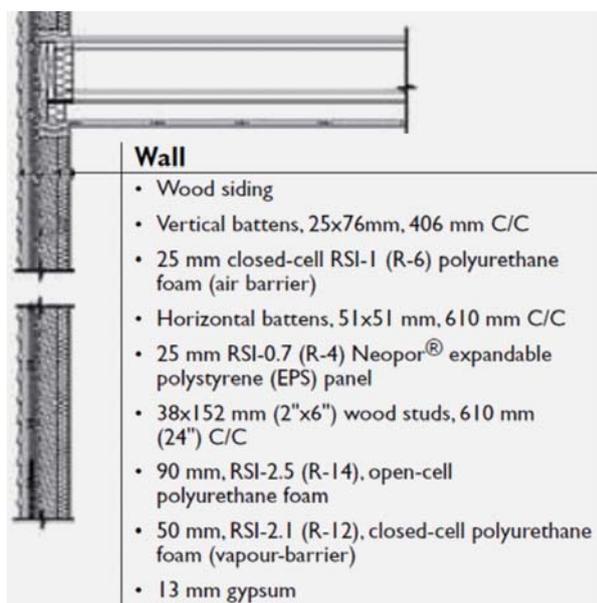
Construction details of the wall assembly (CMHC, 2011a)
